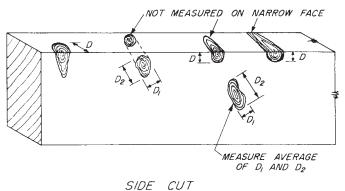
Measurement of Knots in Dimension Lumber Using Alternative Method
